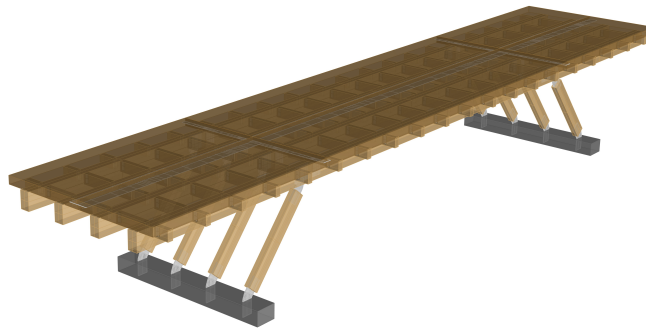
Three-dimensional impression of modular timber bridge with a span of 35 metres
